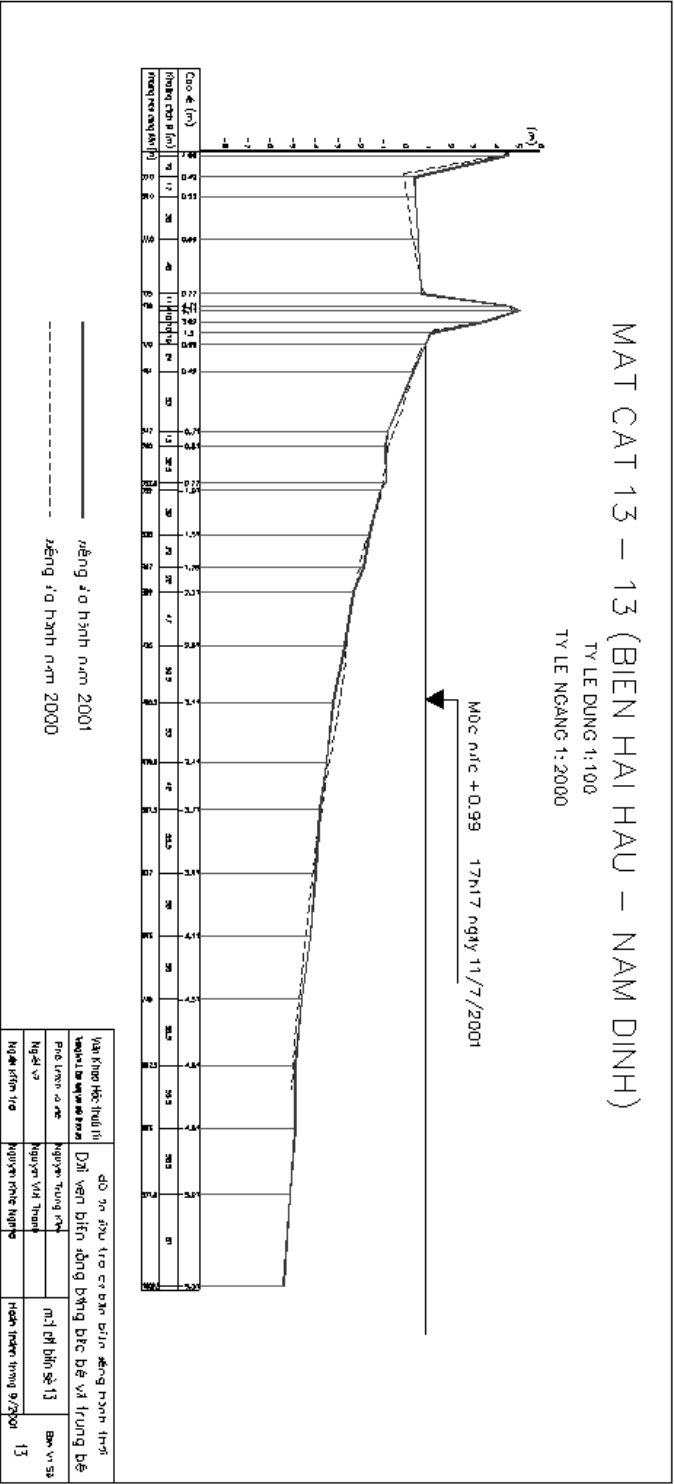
Cross Section MC13 at Hai Hau Beach
